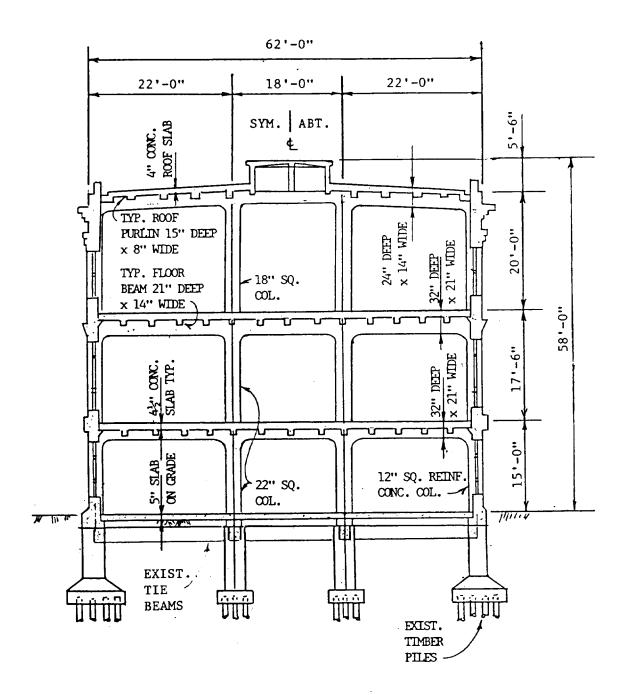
Brick building with concrete framing system. (Sheet 2 of 25)
